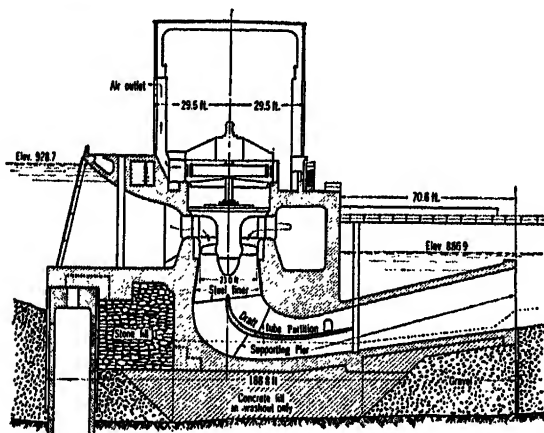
RYBORG-SCHWORSTADT POWER PLANT. CROSS SECTION AT THE CENTER LINE OF A UNIT
